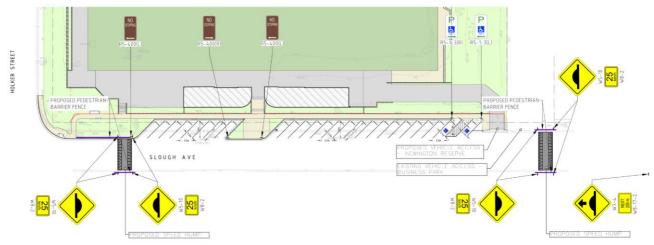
Design plan for the proposed speed humps and angle parking spaces in Slough Avenue, Silverwater
